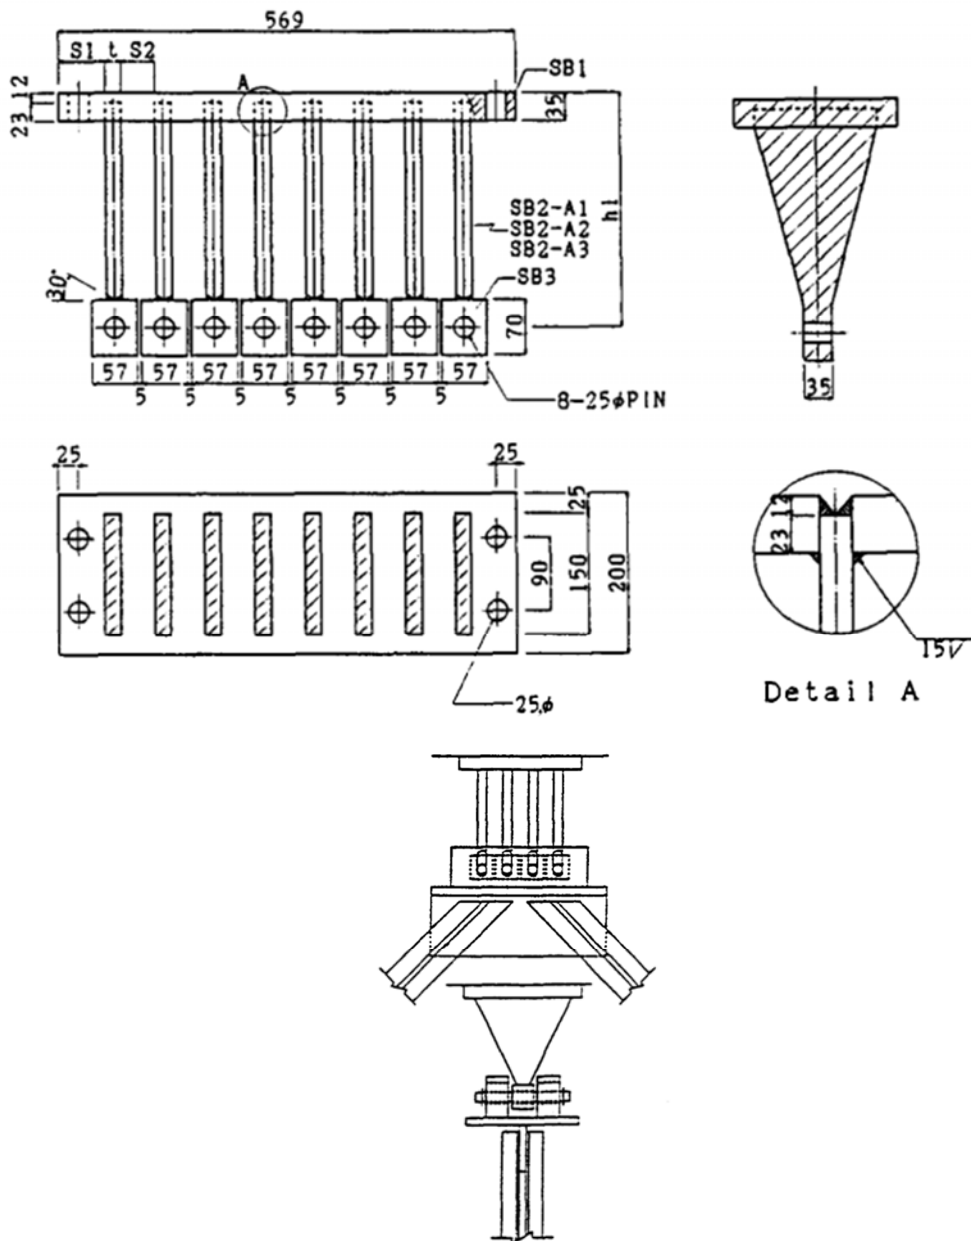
Details of Steel Welded TADAS devices (unit in mm) (Tsai et al. ,1993)
